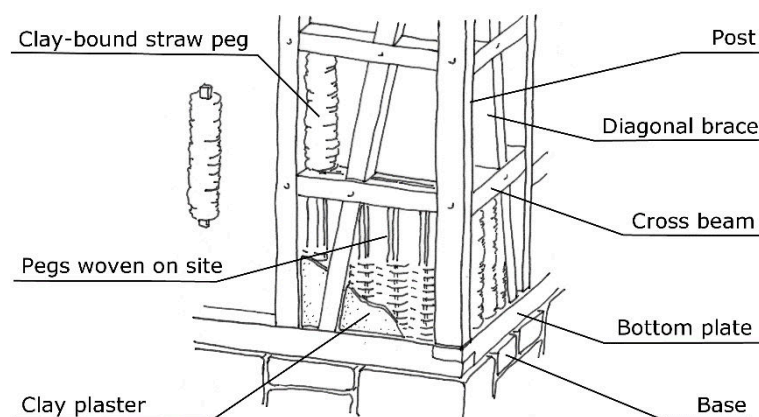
Structural elements of a traditional half-timbered wall, including straw-clay infill, timber frame joints, and various techniques of field filling such as *Lehmstaken* and *Lehmwickel*.
